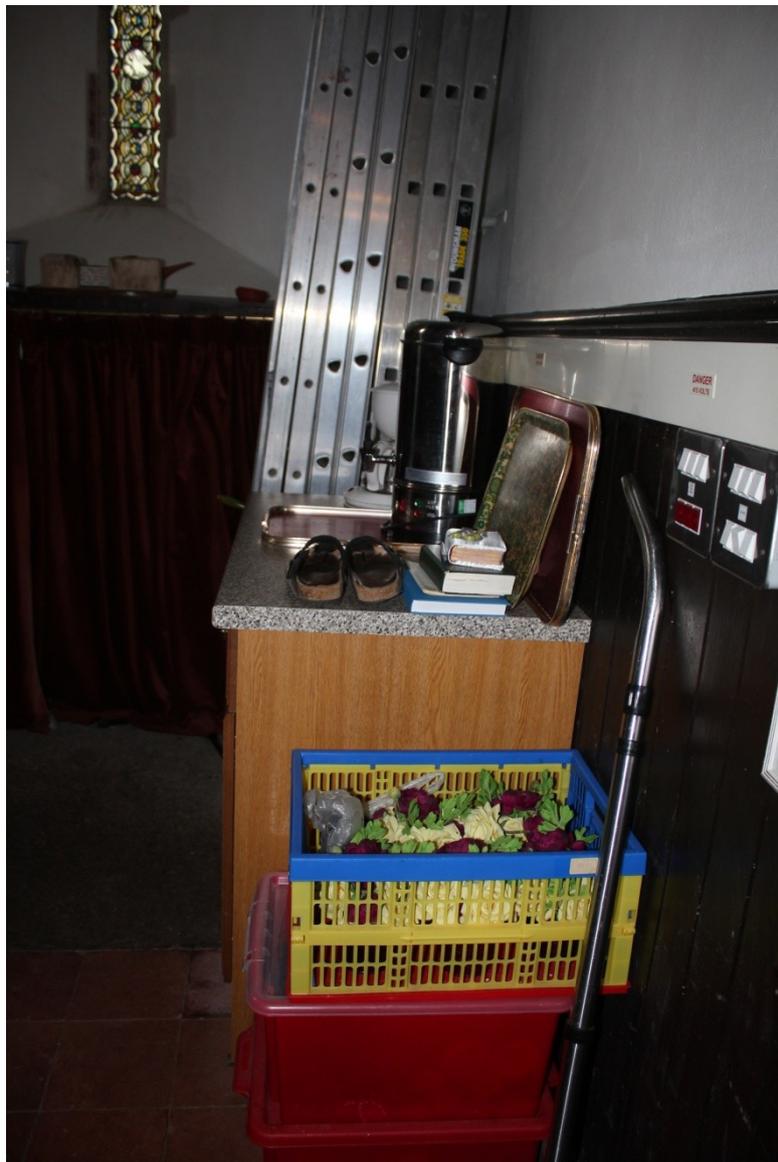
19th century dado panels and modern sink unit on the north wall of the Tower.
